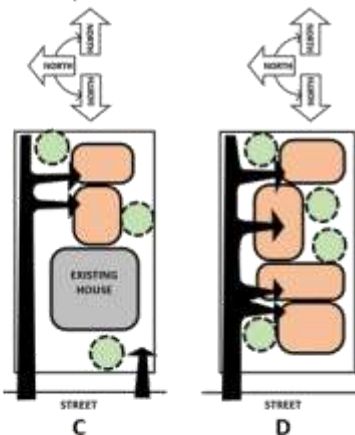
Possible ways to organise dwellings and private open spaces on a site where access on the optimum side is not possible.
